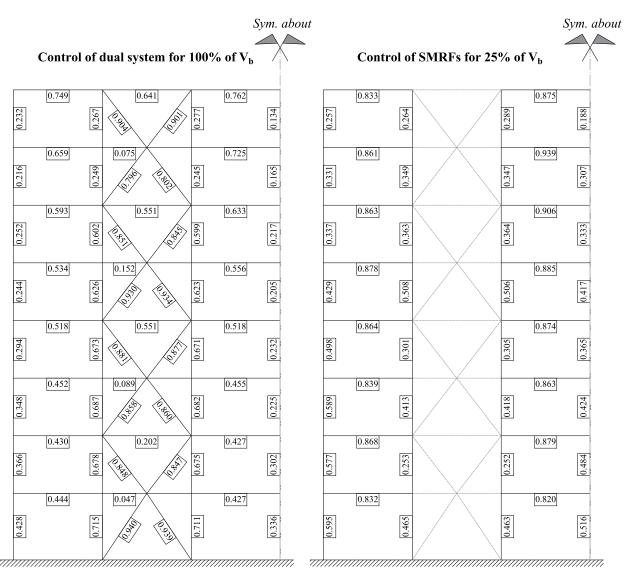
The P-M ratio of designed cross-sections of 8-Story building archetype
